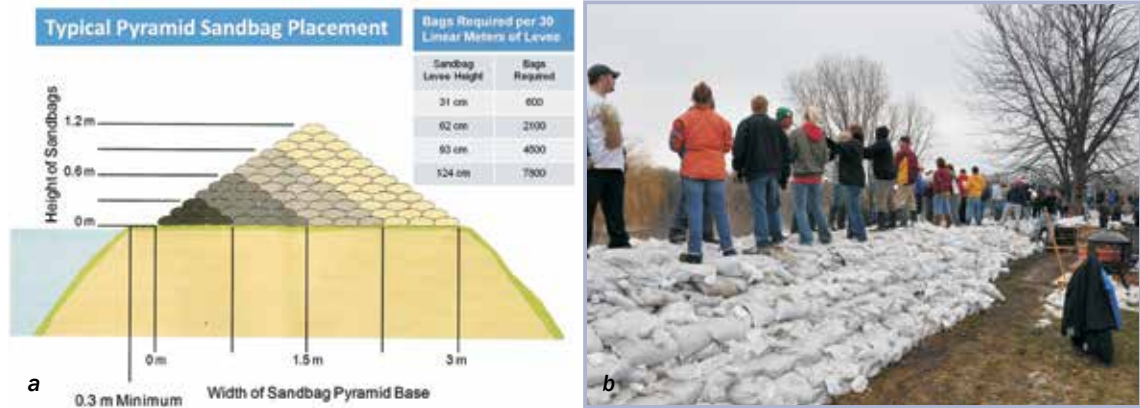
Typical sandbag levee (a) and levee raise with sandbags (b) (courtesy USACE)
